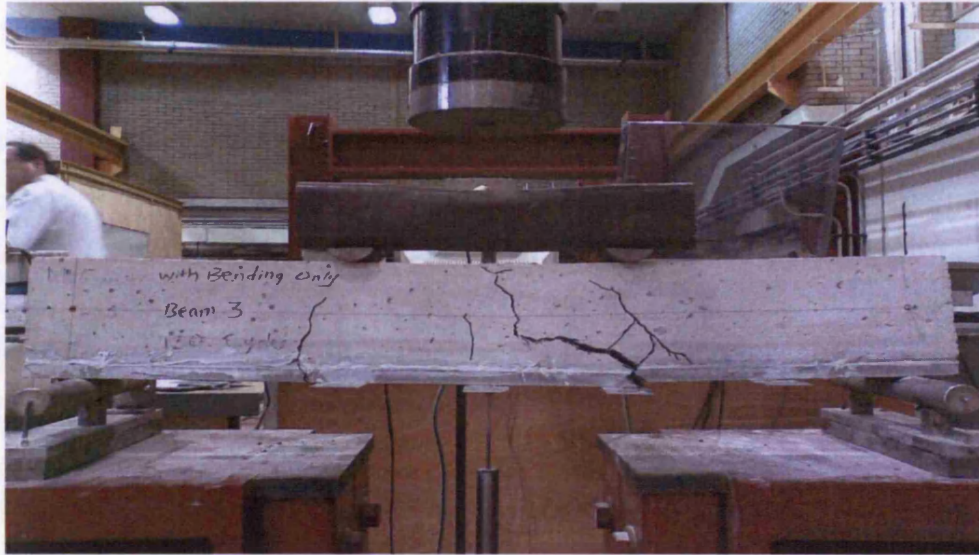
Typical flexural failure of retrofitted beam with one strip in the bottom and without shear reinforcement
